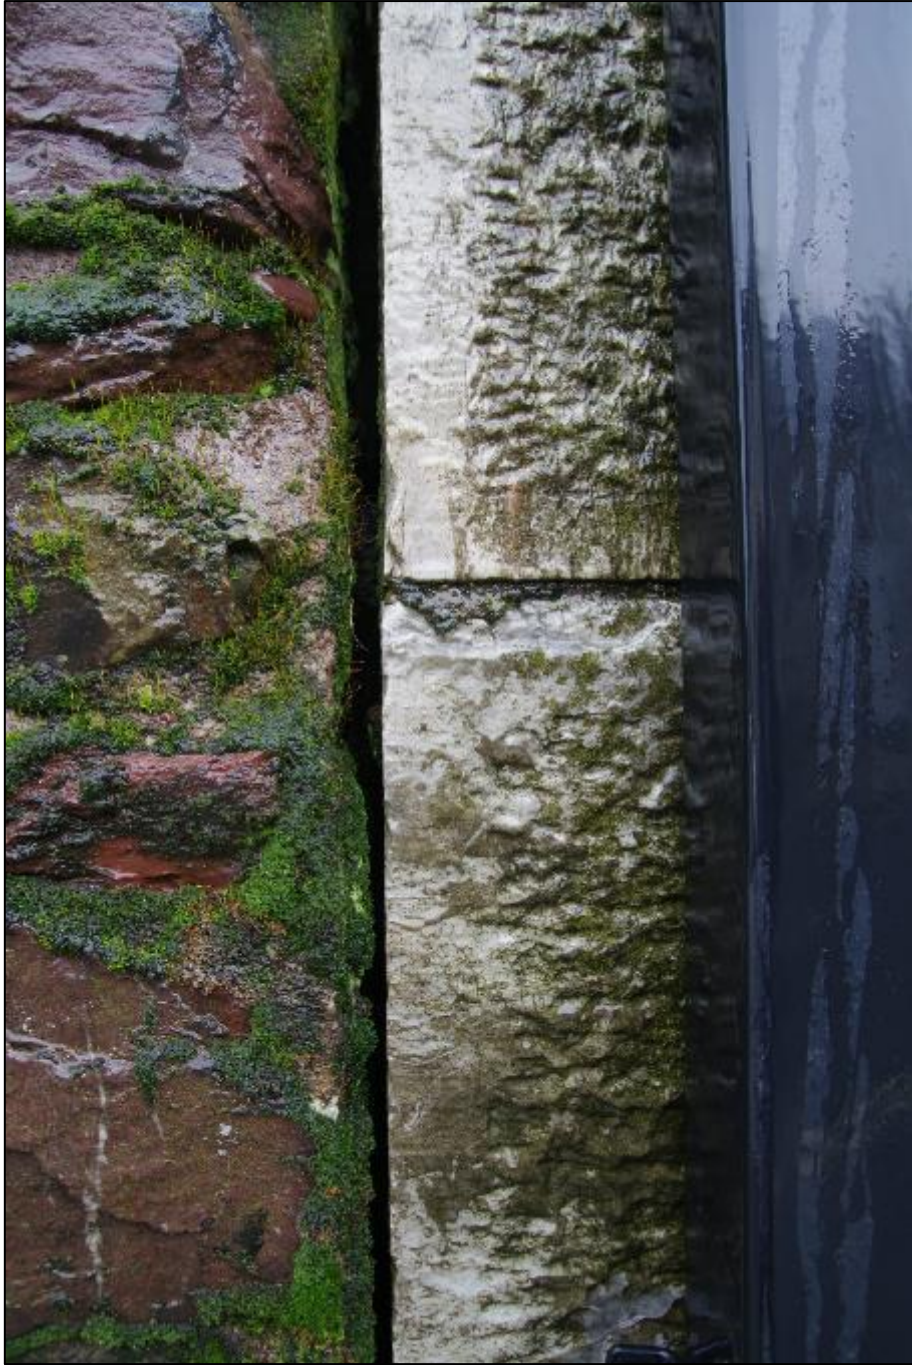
Detailed view of section where boundary wall adjoins the corner of the workshop building (CHC 7)
